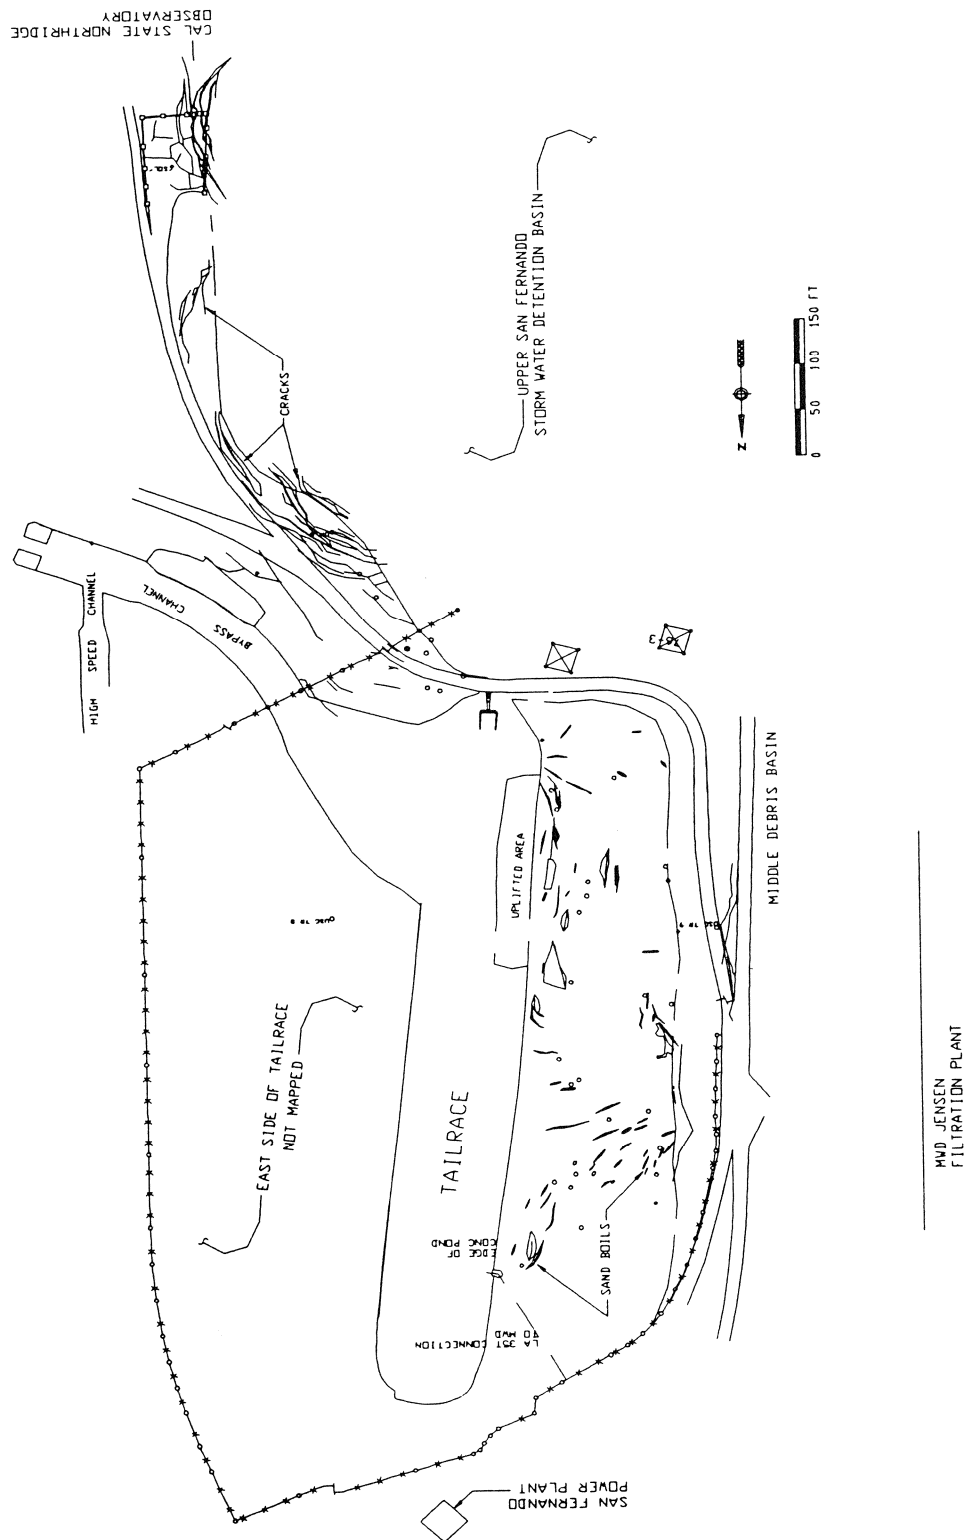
Location of cracks and sand boils in the vicinity of Power Plant Tailrace.
